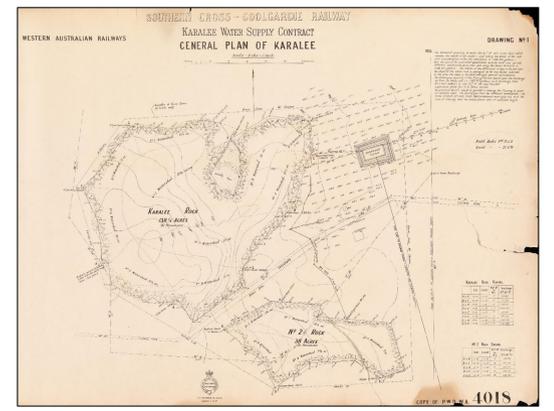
Public Works Department Central Plan of Karalee (State Records Office of WA)
